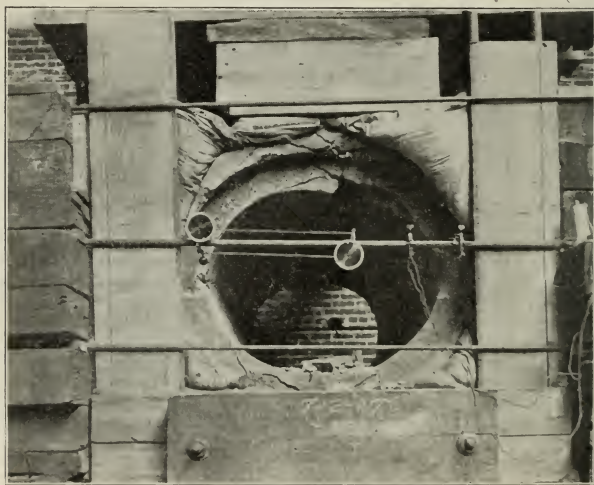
VIEW OF REINFORCED CONCRETE PIPE AFTER TEST.
